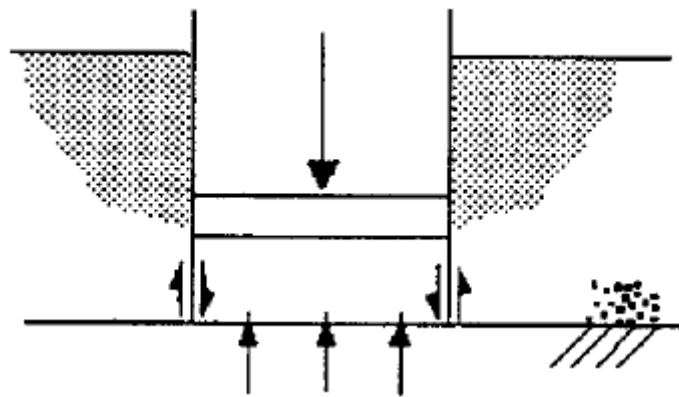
Foundation failures modes: Punch-through (SNAME, 2008)
